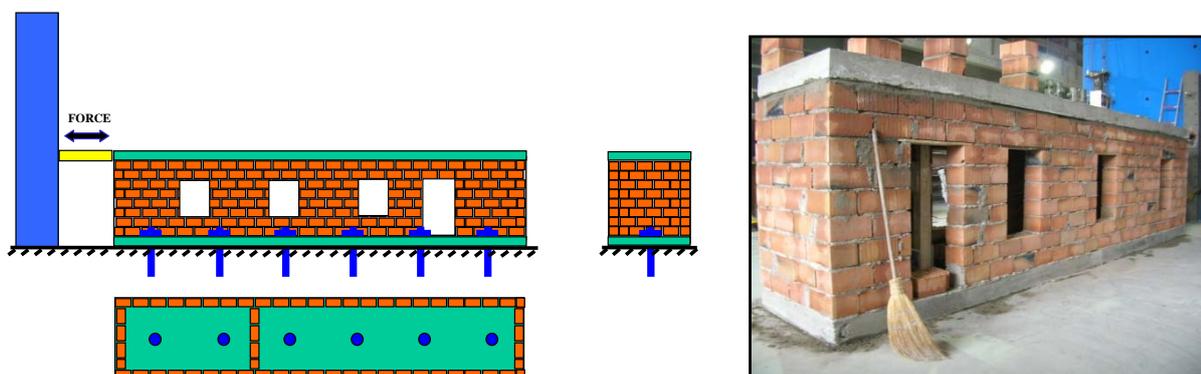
Half-scale brick masonry house model constructed in the laboratory
